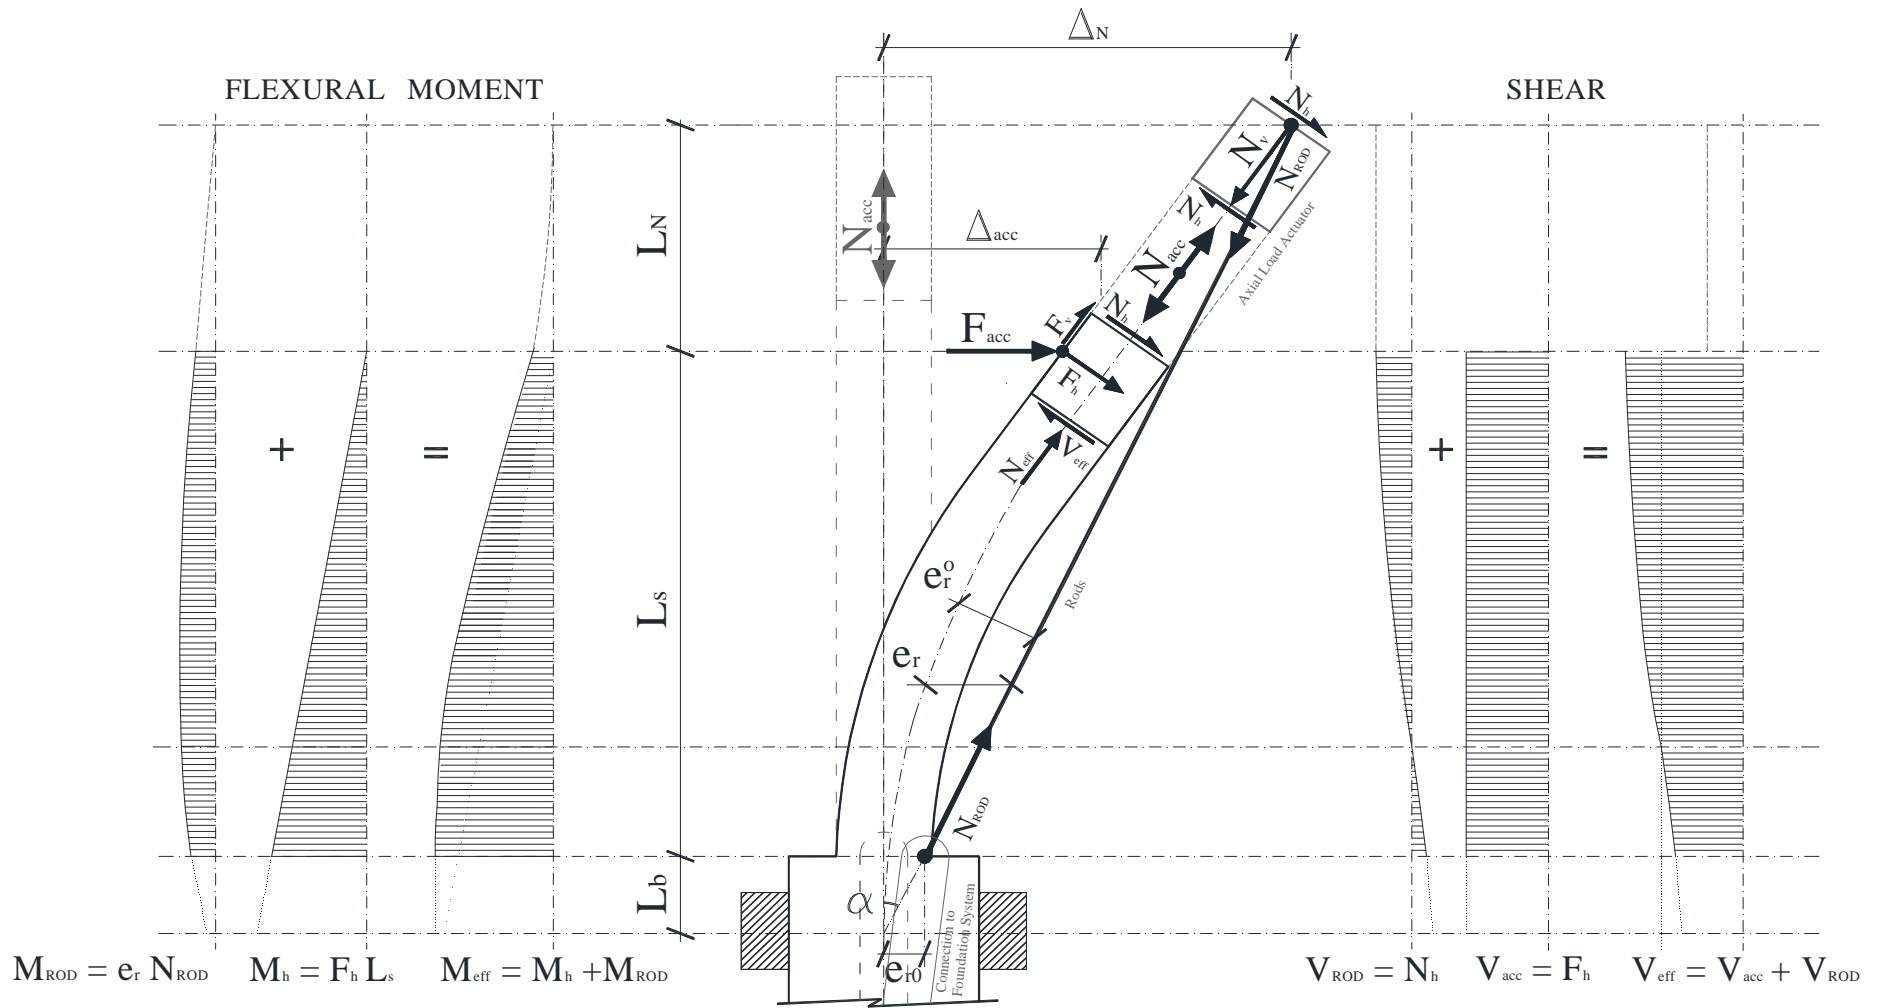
Schematic diagram for P-Δ corrections for the column test setup carried out in this research and described in section 4.2.2.
